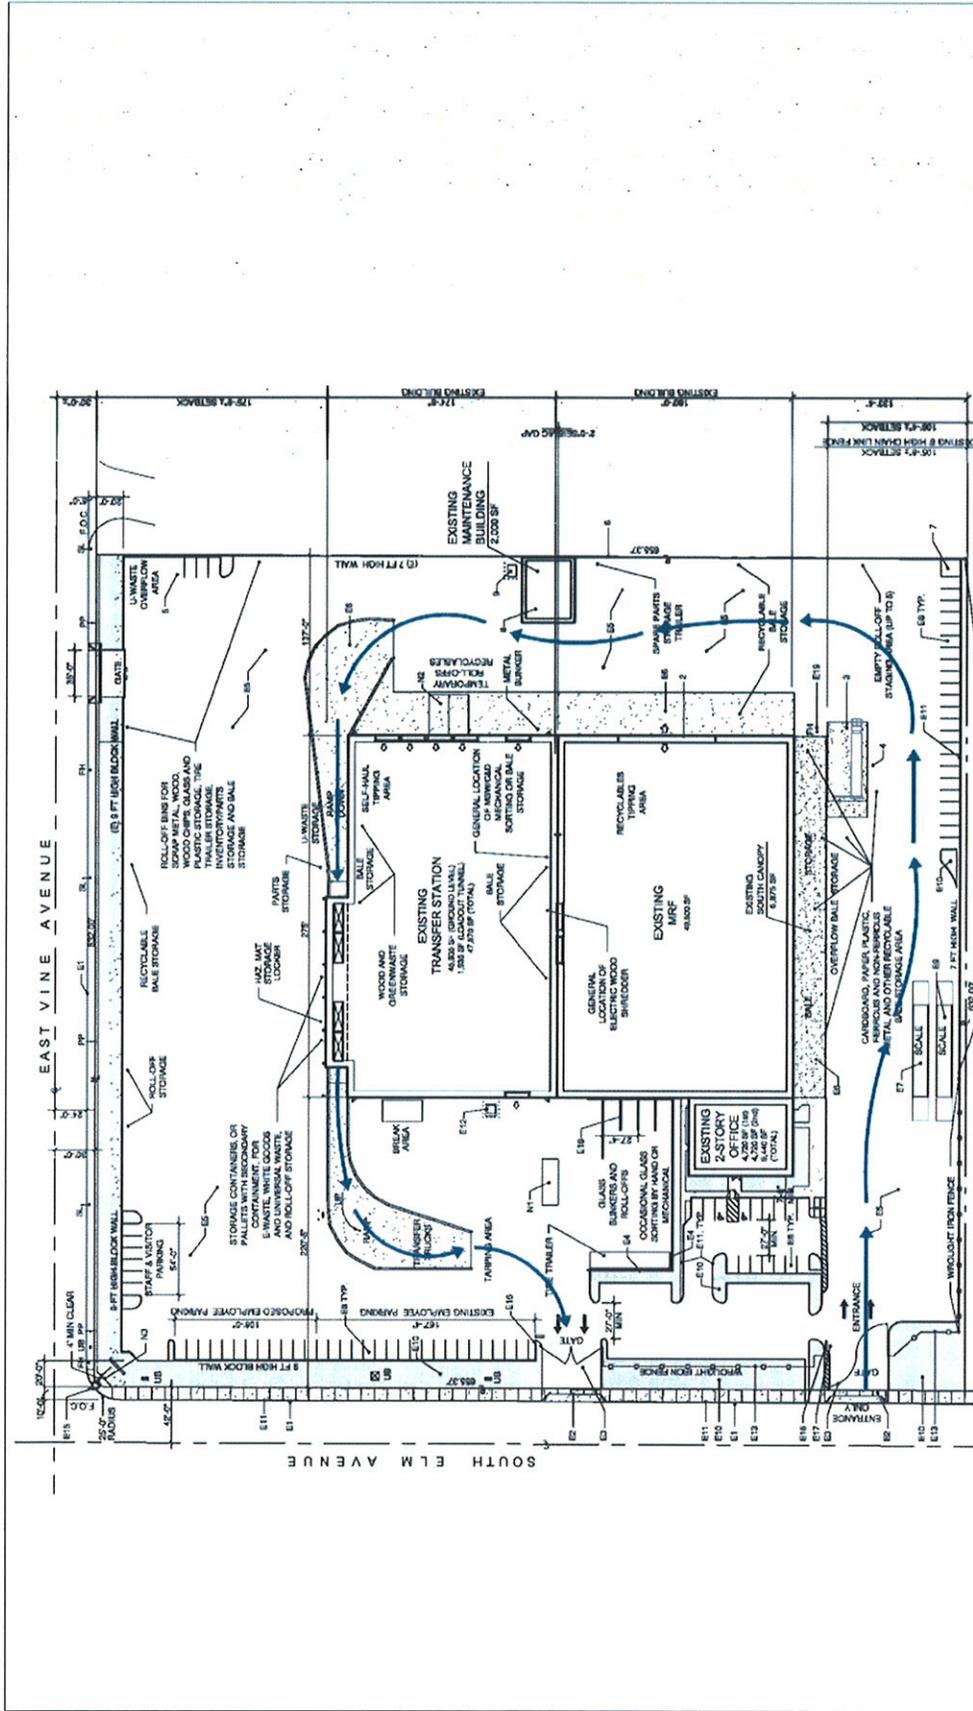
E: TRANSFER TRUCKS ON-SITE CIRCULATION PLAN
